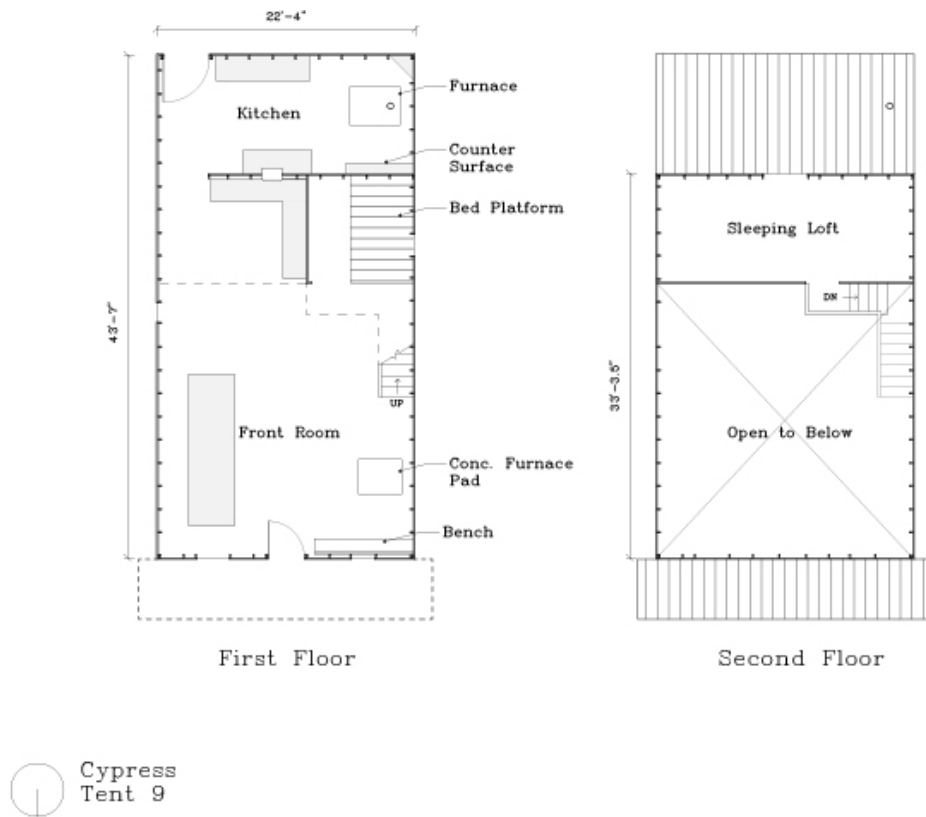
Plan drawing of Tent 9 at Cypress Campground.
